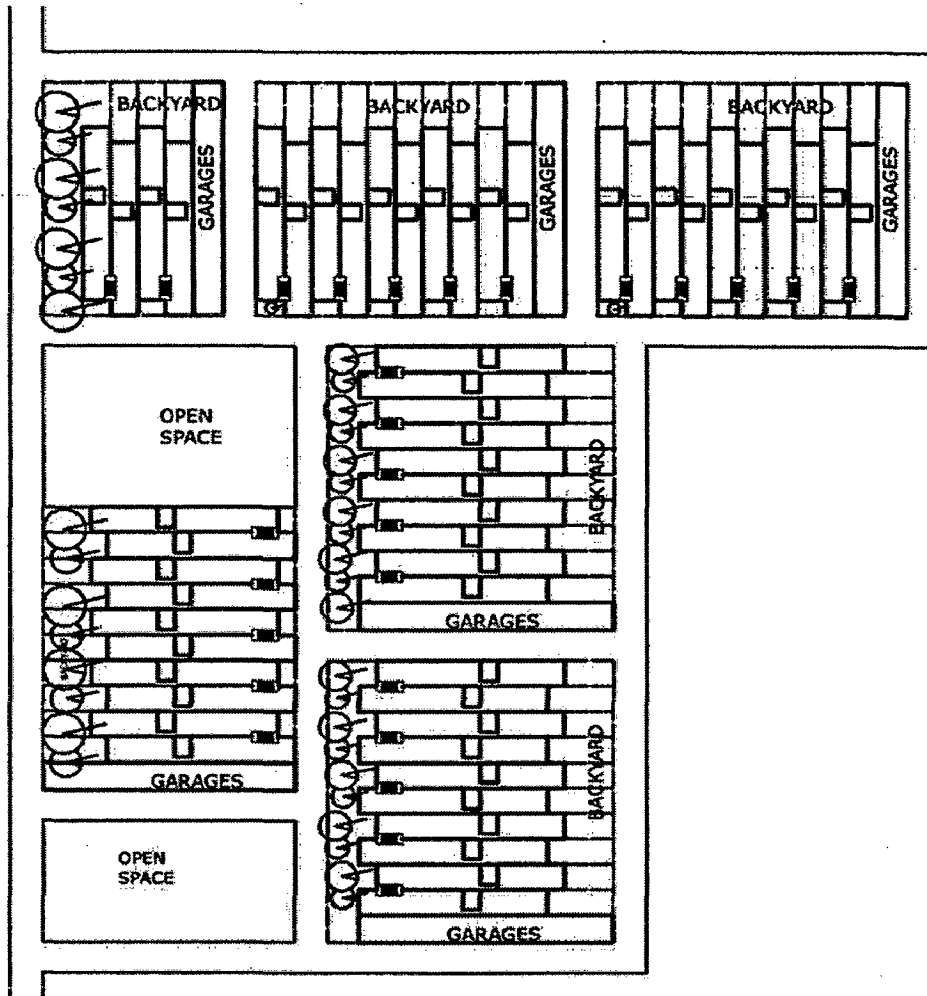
Site plan option and view in L-shaped site of Option-2
